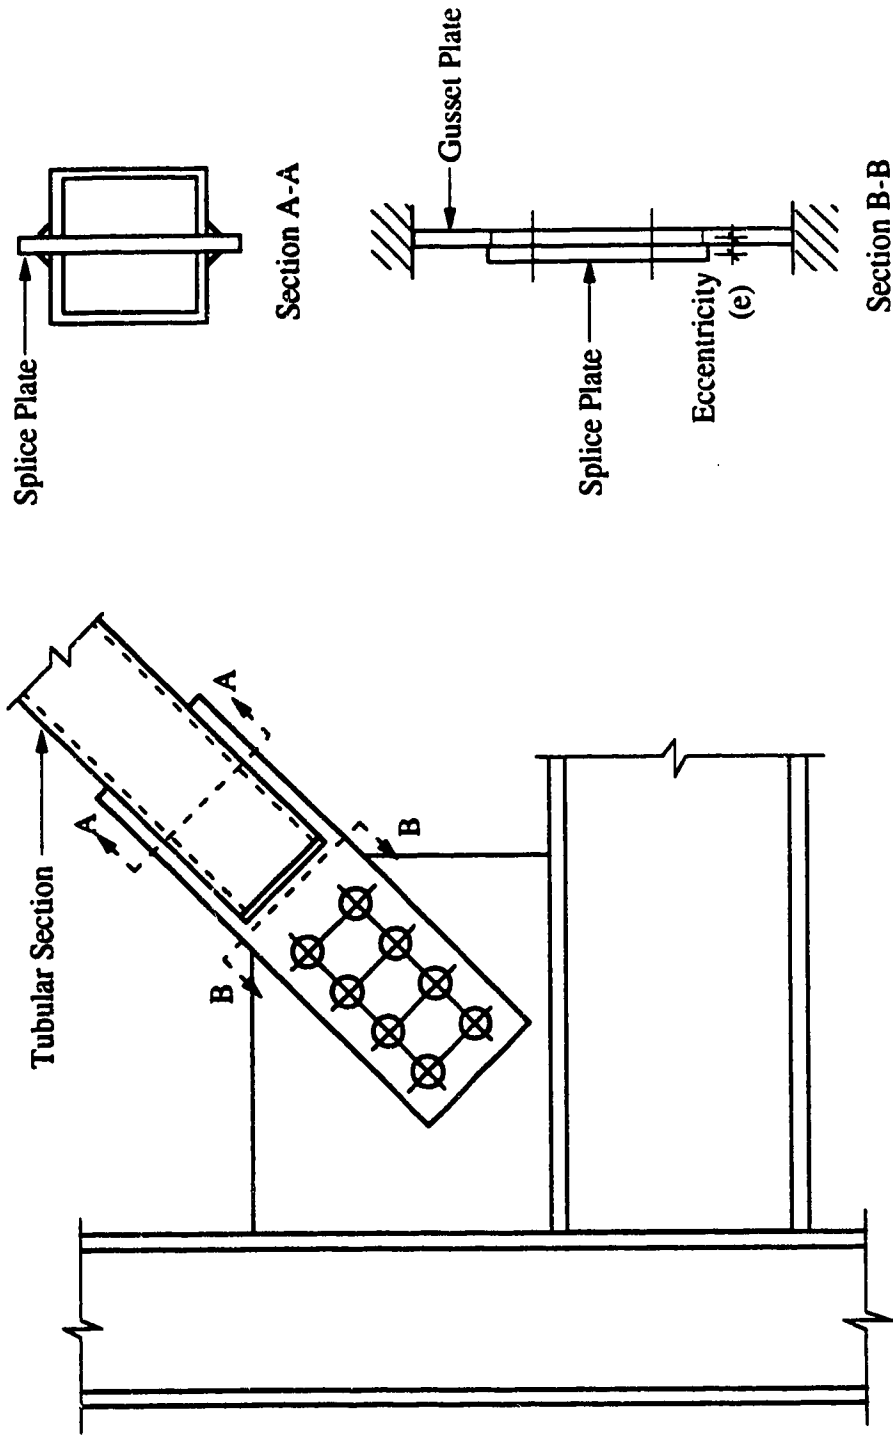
Gusset Plate Connection of Tubular Section Bracing
